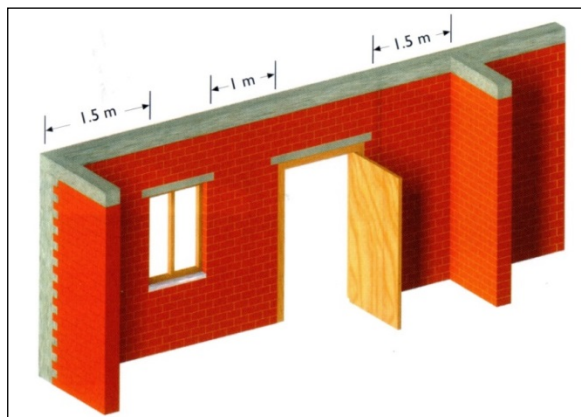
Example of Typical Geometric Limits in a Load Bearing Wall
